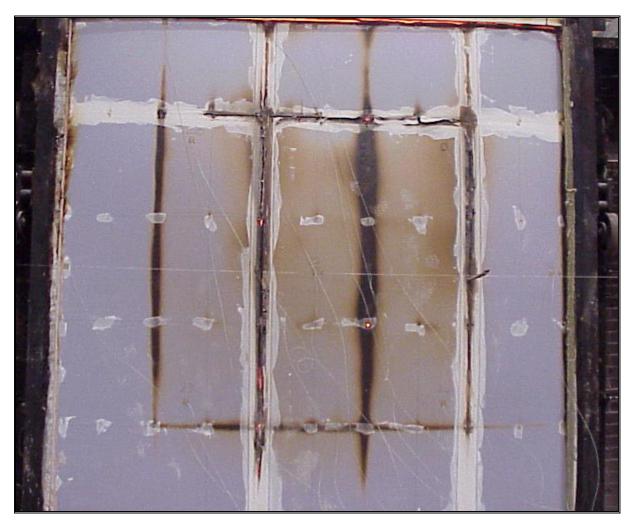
View of the unexposed face at 102 minutes (after insulation failure).
